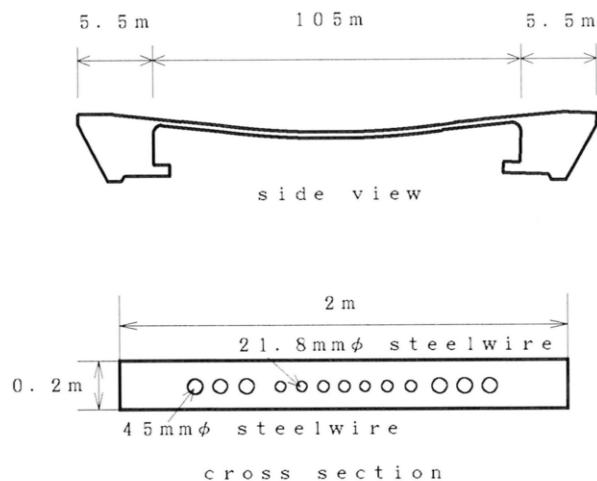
The Umenoki Bridge (a stress ribbon pedestrian bridge).
